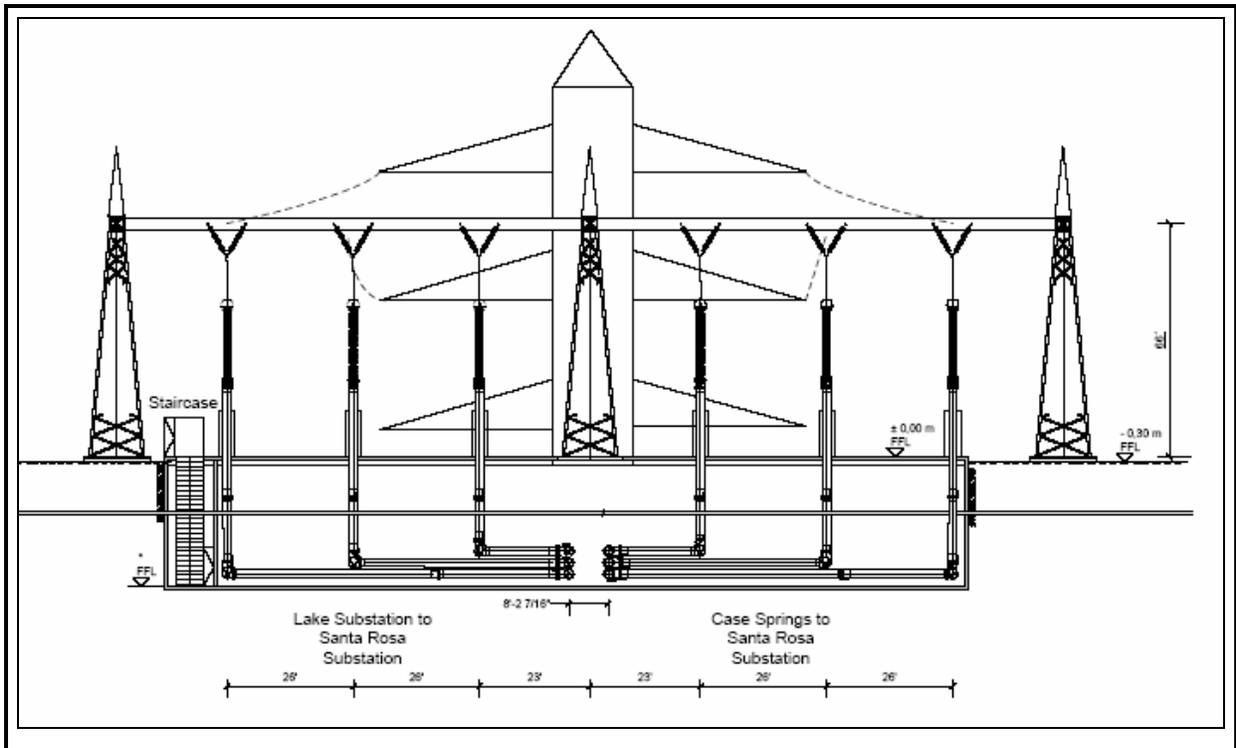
(1 of 2). Alternative Transmission Line Underground Technology Elevation
